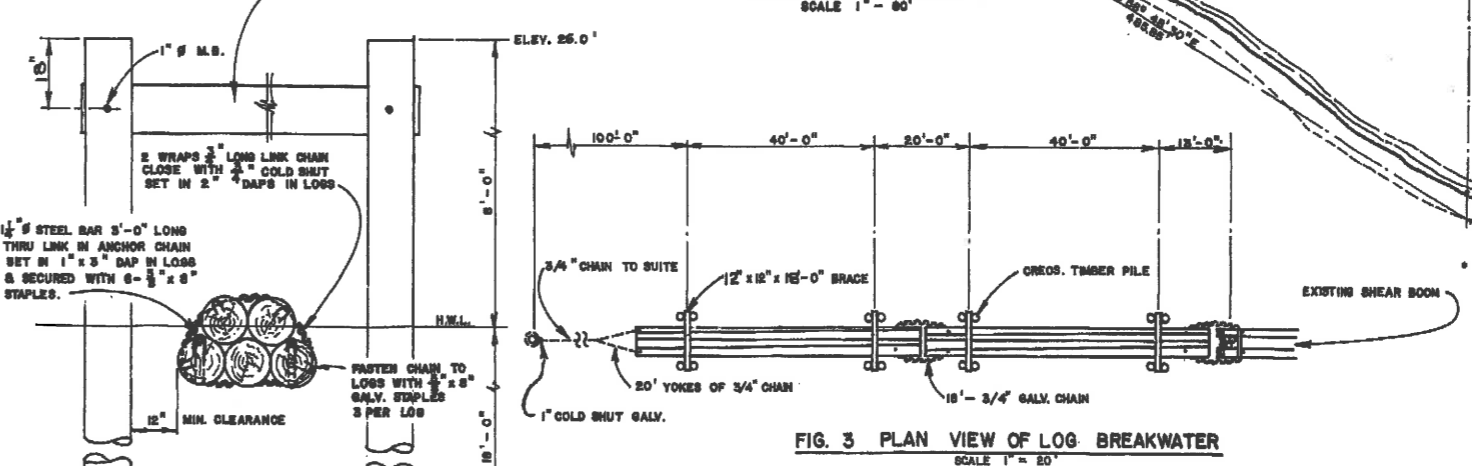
PLAN VIEW OF LOG BREAKWATER
